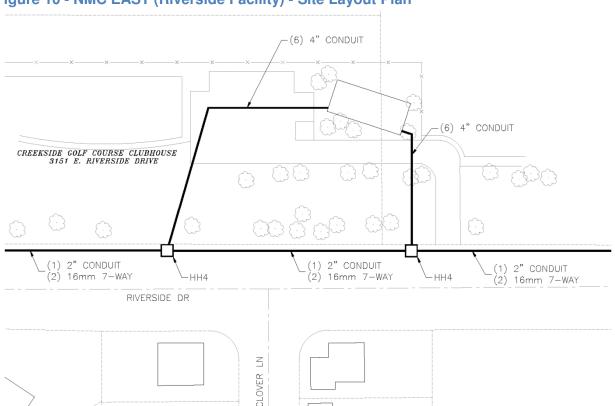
NMC EAST (Riverside Facility) - Site Layout Plan
